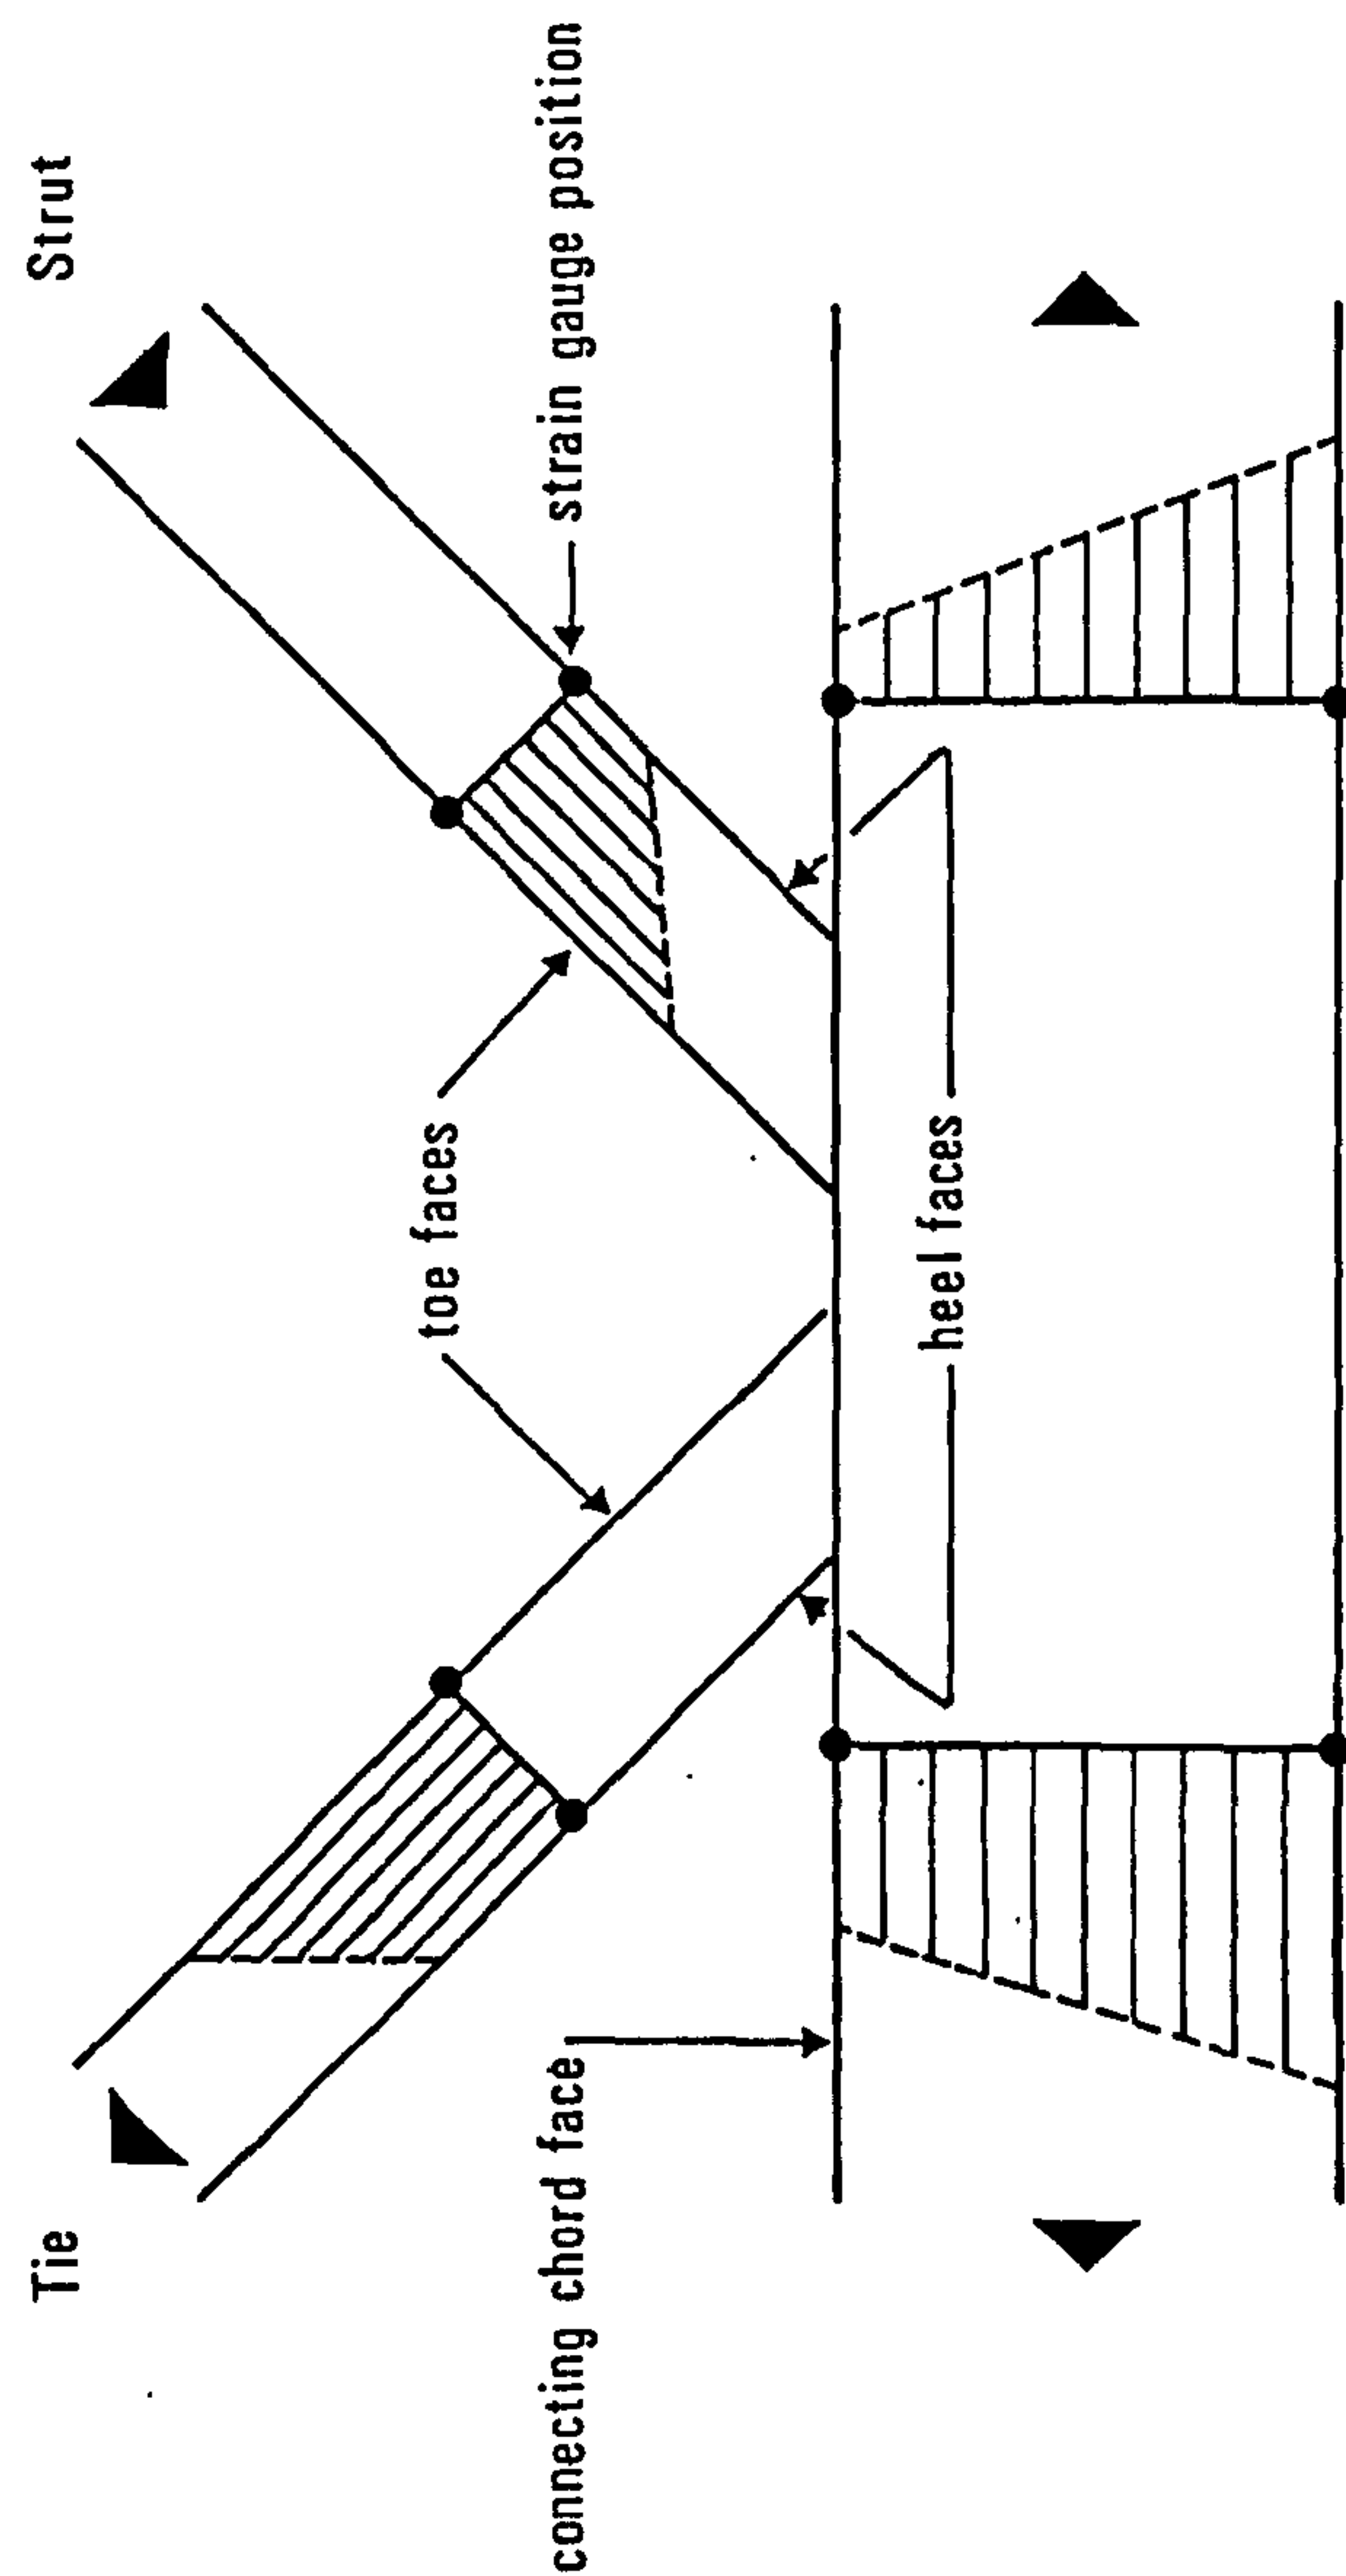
Typical example of the stress distribution, at the ram failure load, in the gap joints of truss T1.
